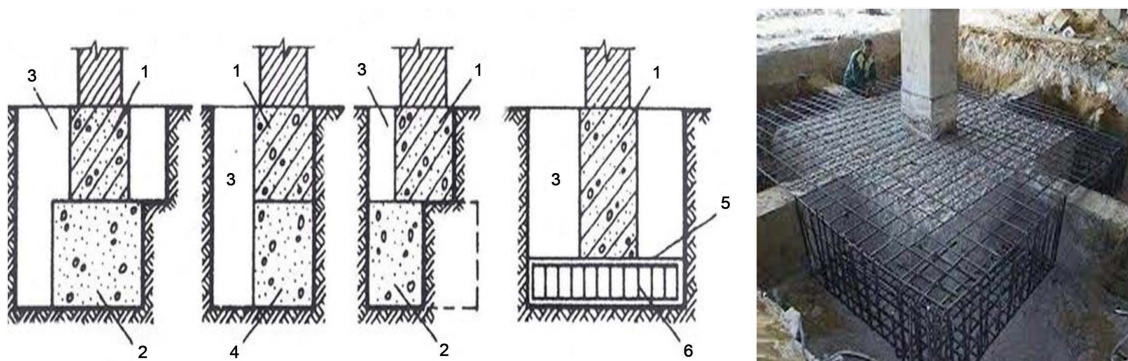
Proposing a solution to strengthen the single foundation by expanding the bottom of the foundation. In Figure 5: 1—foundations; 2—column; 3—dug pit; 4—wall; 5—concrete slabs; 6—steel.
